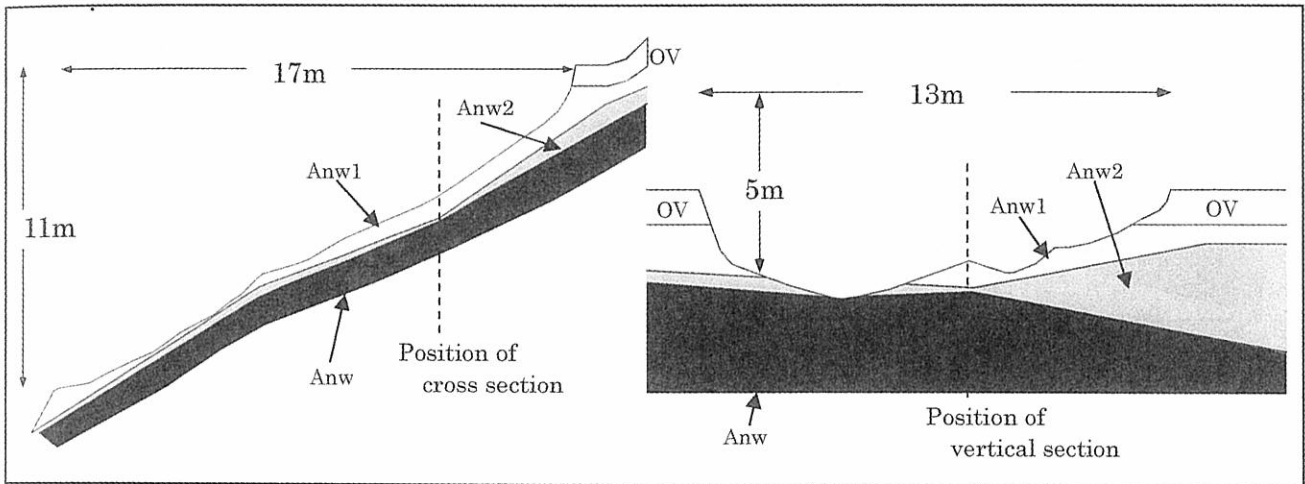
Vertical section(left) and cross section(right) of slope failure 4
